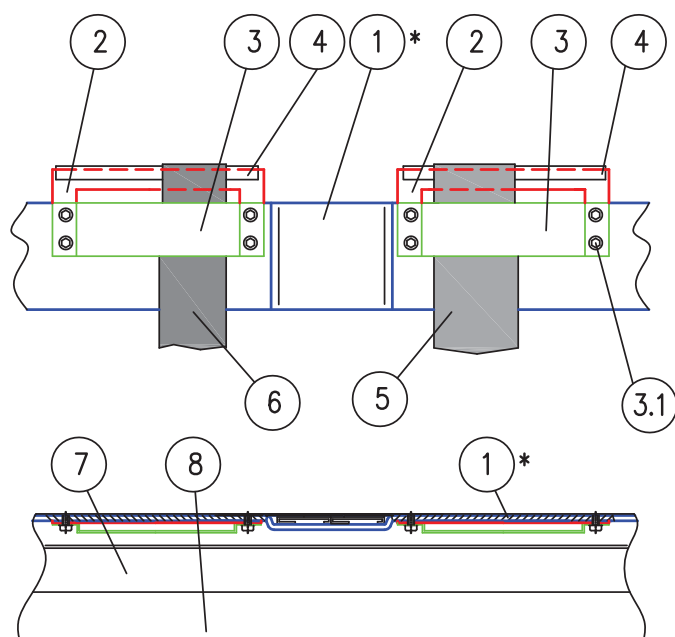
Cable fastening to cable carrier side bracket for type 635 or 825 and HS version lifts
